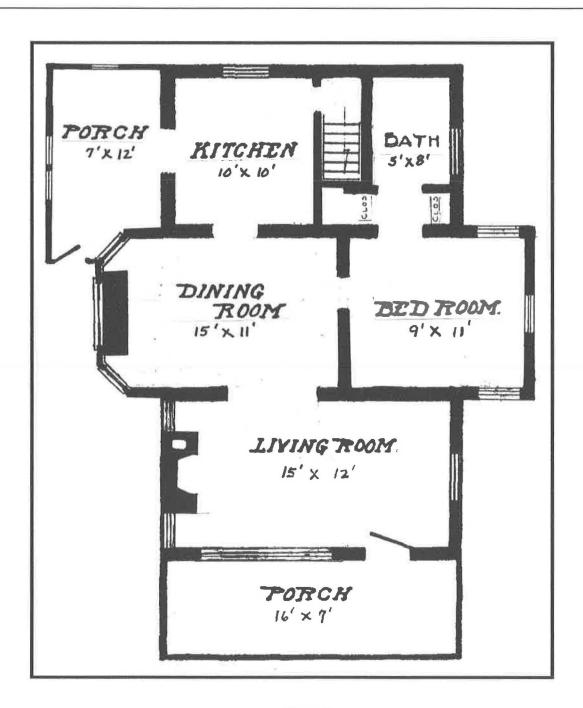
Bregant Floor Plan Not to scale (Plan based on Aladdin Homes "Chester" model)
